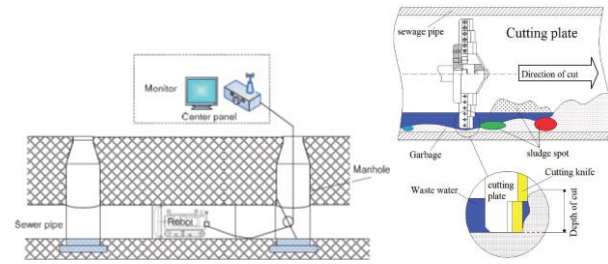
A crawler type pipe cleaning and inspection robot [16]
